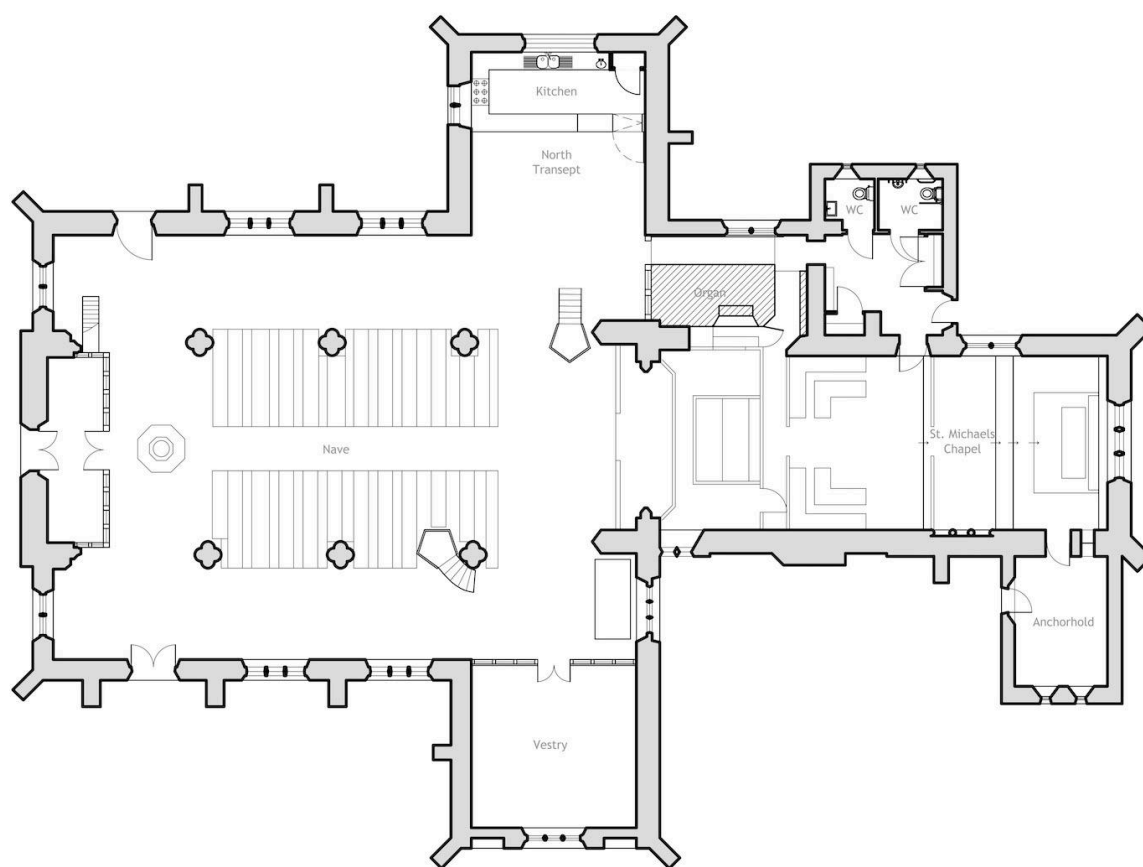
Plan of All Saints Church, King's Lynn, featuring the anchorhold on the warm south wall with the squint facing Saint Michael's Chapel to the north (scale 1:200). © Waite & Wallage Architects, c. 2020.
